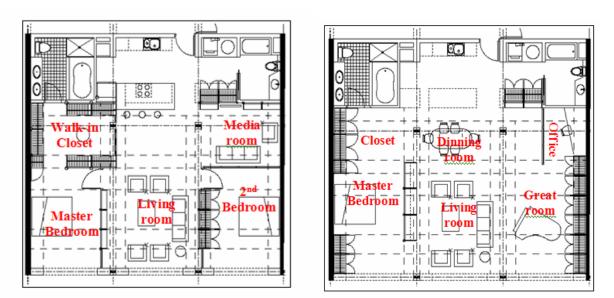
Two bedroom closed floorplan Figure 6.2- One bedroom open floorplan (Larson 2004)
